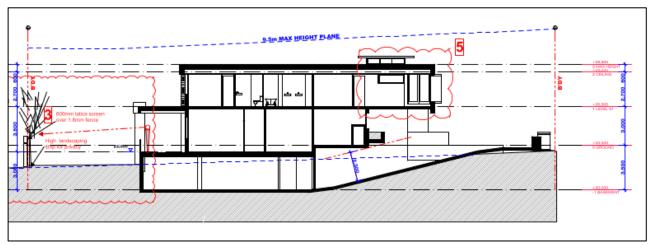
Section drawing of the proposed dwelling including 9.5m height limit line.
